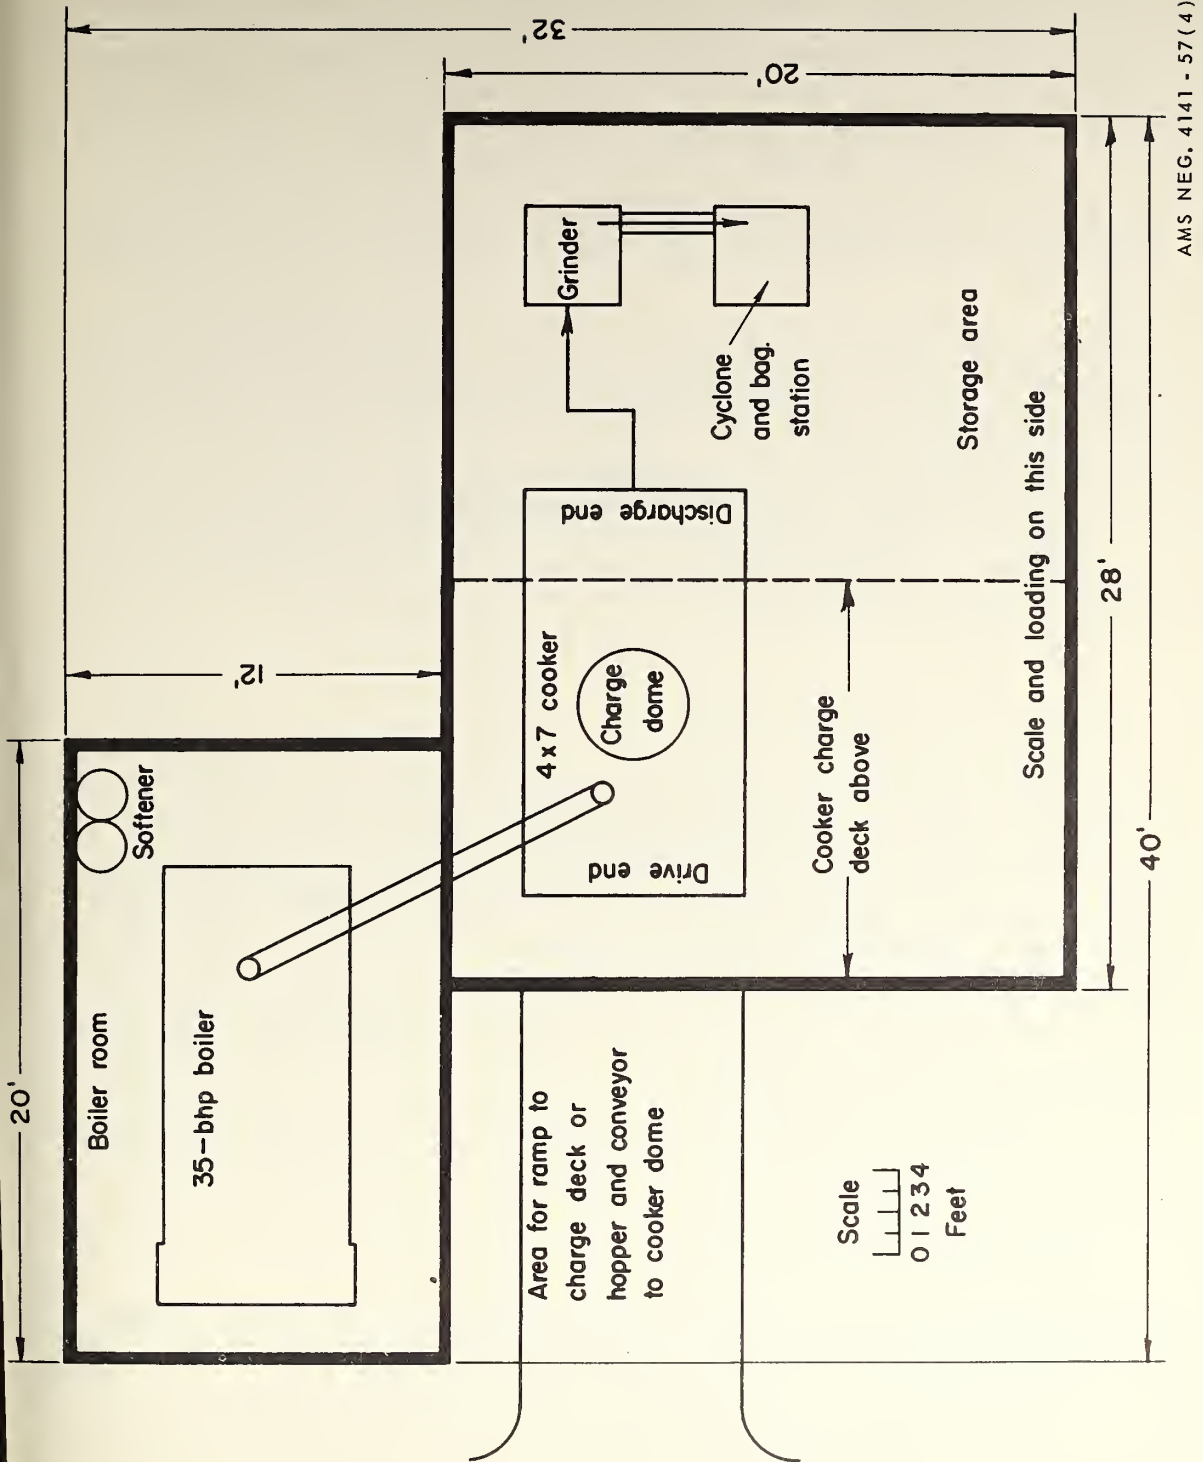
SAMPLE LAYOUT FOR PLANT A
